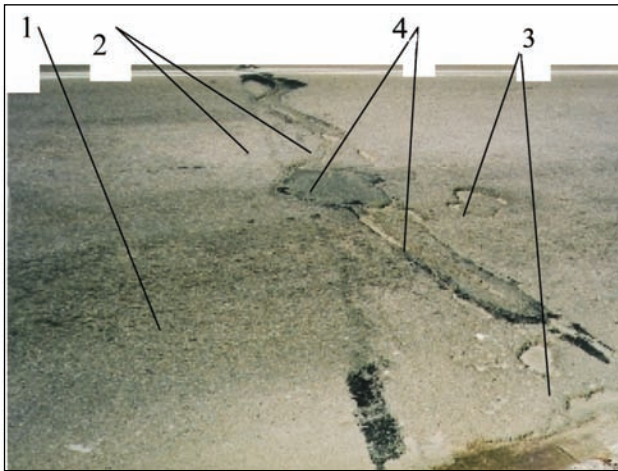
Bridge surfacing deterioration: 1 – surface wearing; 2 – cracks; 3 – potholes; 4 – patches
